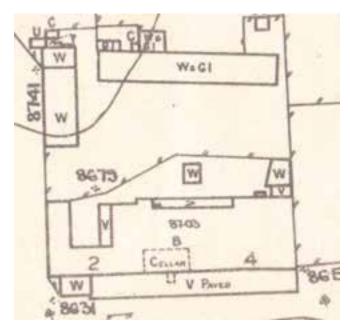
The sewerage map dating to 1938-39 shows the footprint of the hotel and outbuildings at this date. The hotel had a u-shaped plan at the west end (opening to the north), with two small verandahs on the north elevation, a cellar and front paved verandah (MDHS).
